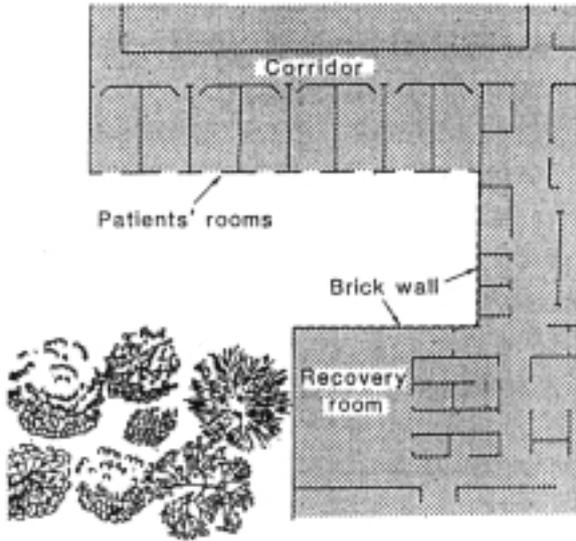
Plan of the second floor of the study hospital showing the trees versus wall window views of patients. Data were also collected for patients assigned to third-floor rooms. One room on each floor was excluded because portions of both the trees and wall were visible from the windows. Architectural dimensions are not precisely to scale.
